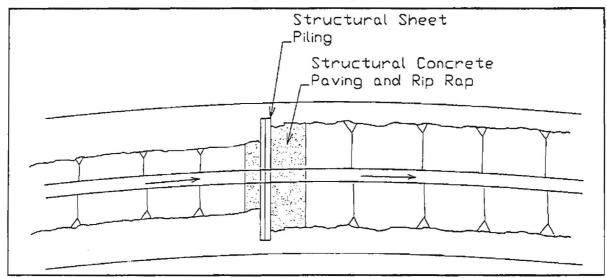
Plan View of Typical Straight Drop Spillway
